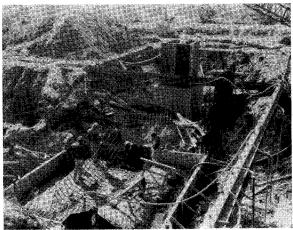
Early construction phase of the Fabridam showing the by-pass channel in background, the interlocking sheet piling, the well point system for dewatering and the third pour conditions for the vault building.
